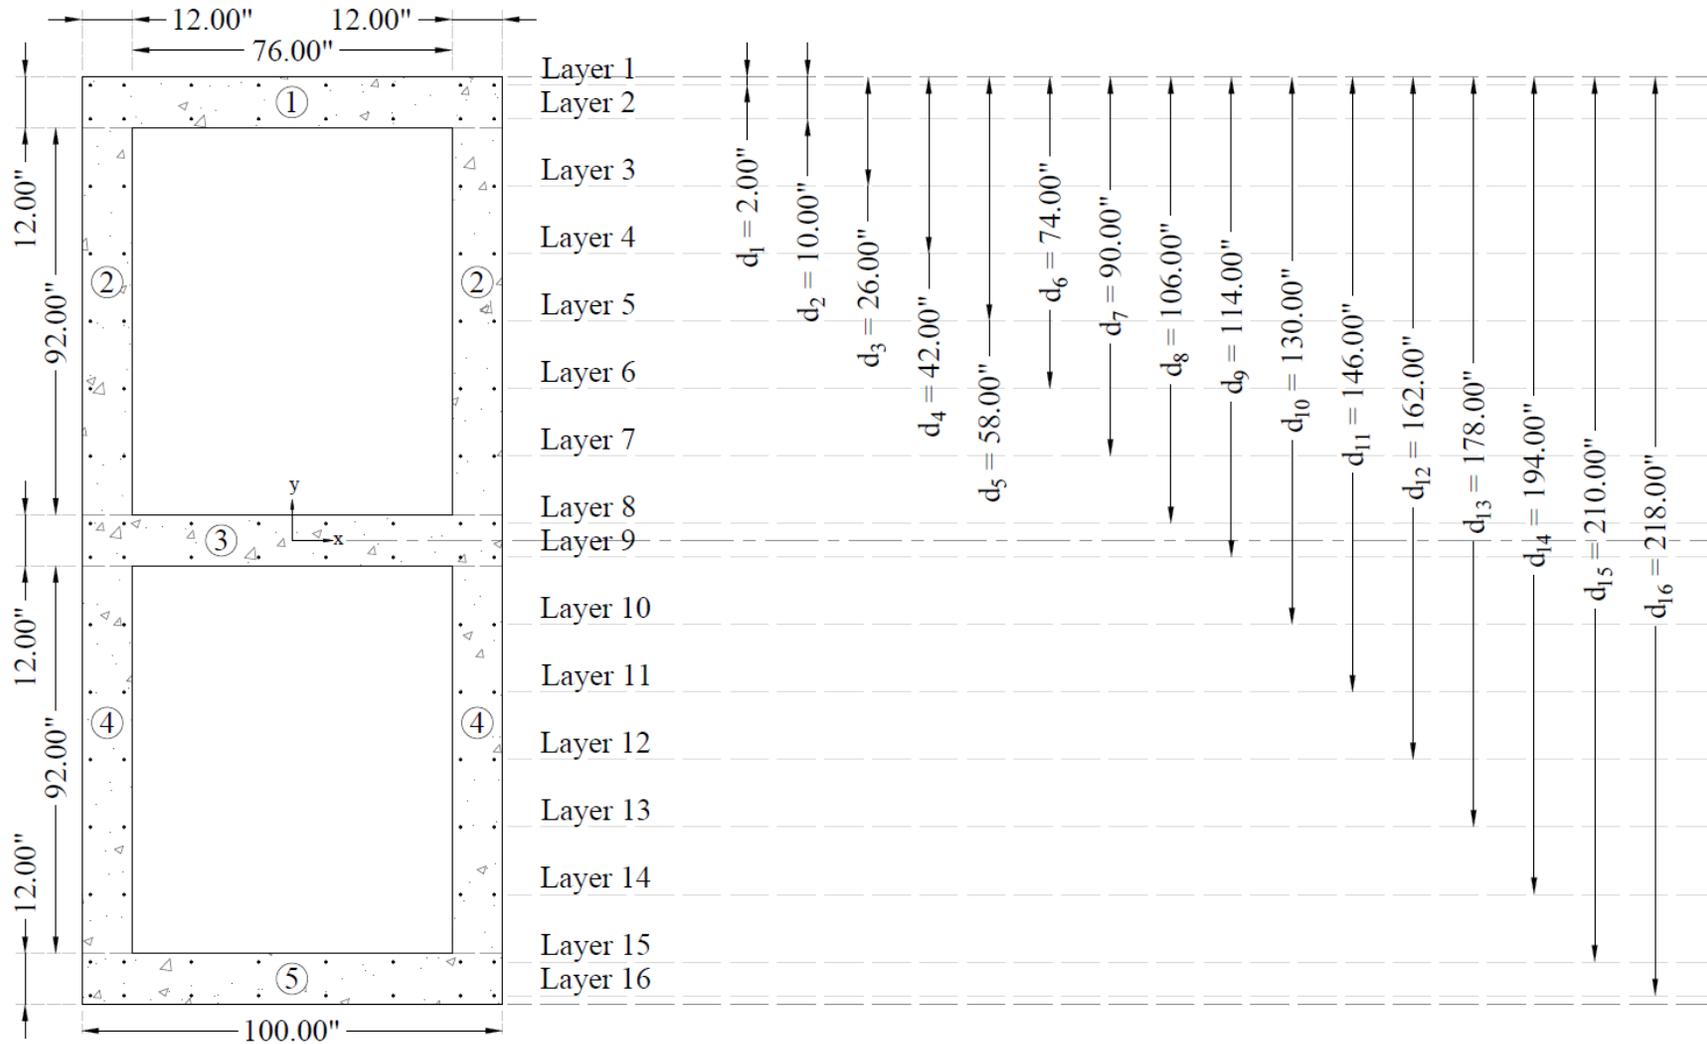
Reinforced Concrete Core Wall – Cross-Section and Reinforcement Design Data
